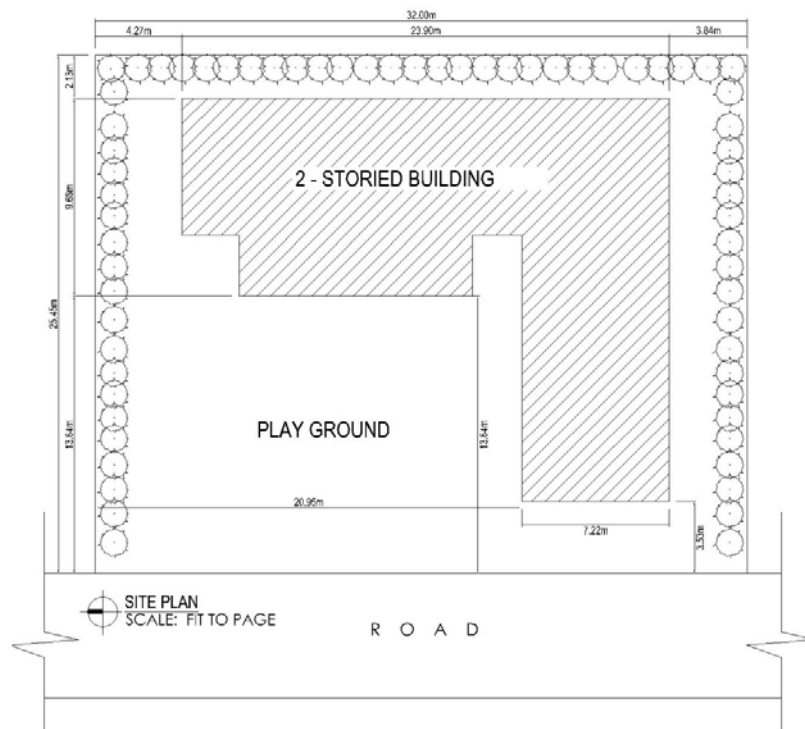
Site plan of KHASDOBIR GOVERNMENT PRIMARY SCHOOL . (Source: author)
